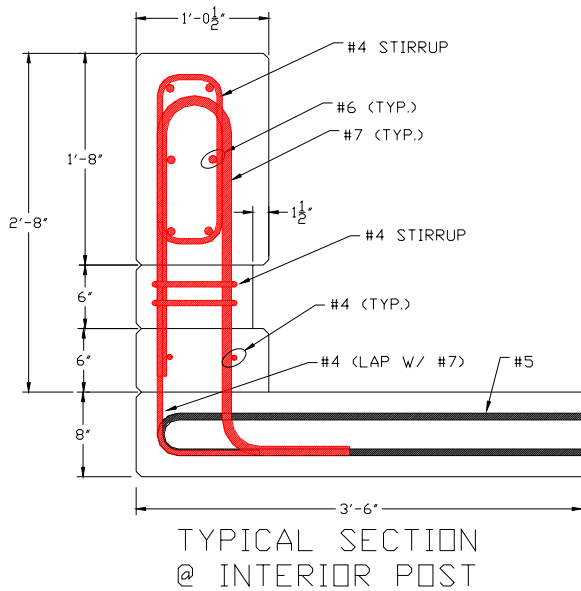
FDOT Variant of the Modified Kansas Corral Bridge Railing.
